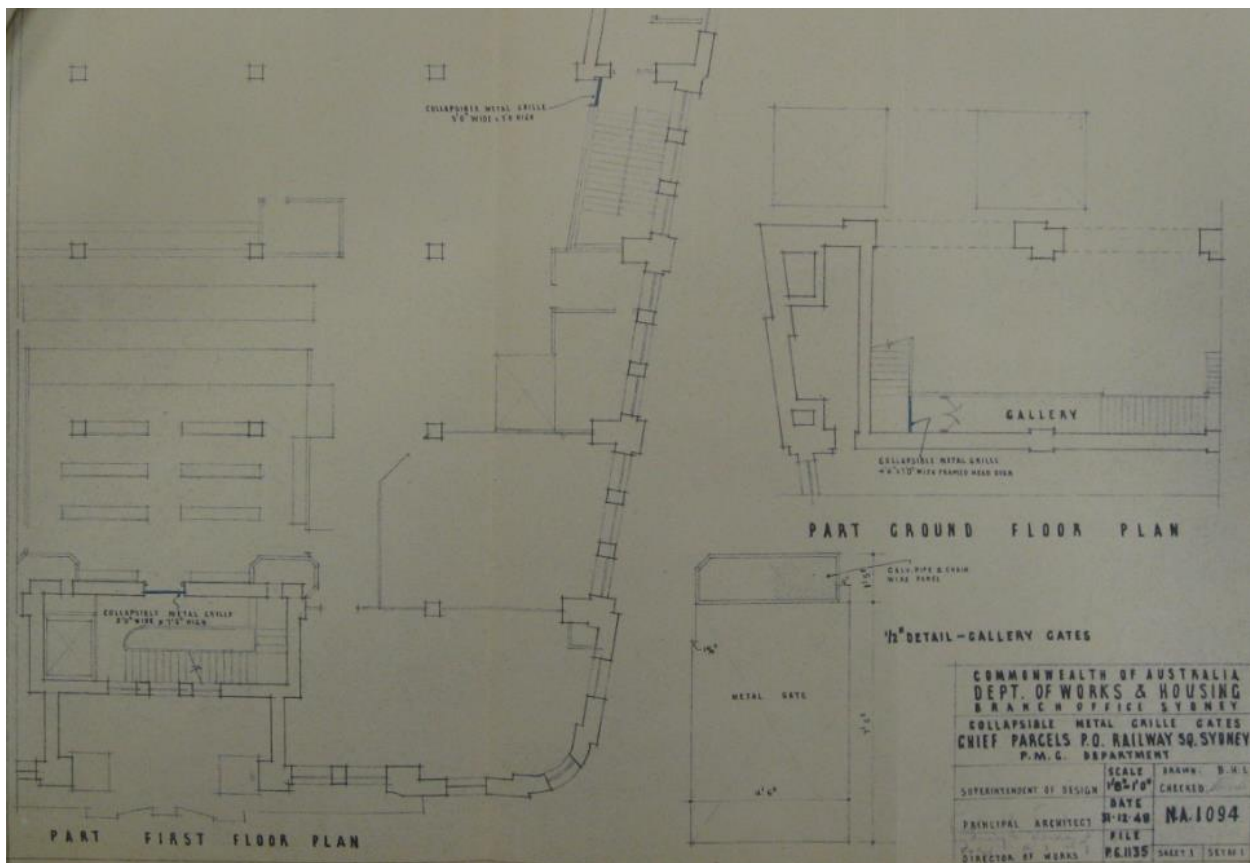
Part Ground and First Floor Plans, Collapsible Metal Grille Gates, Chief Parcels PO Railway Square, Sydney, 1949
